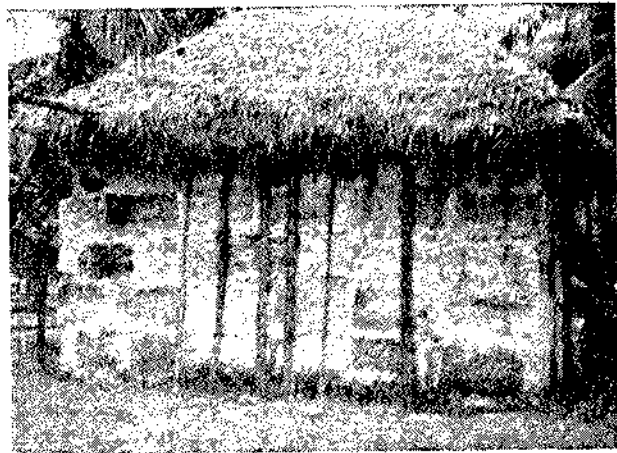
A dwelling hut constructed with sandstone blocks at Kiltan.
